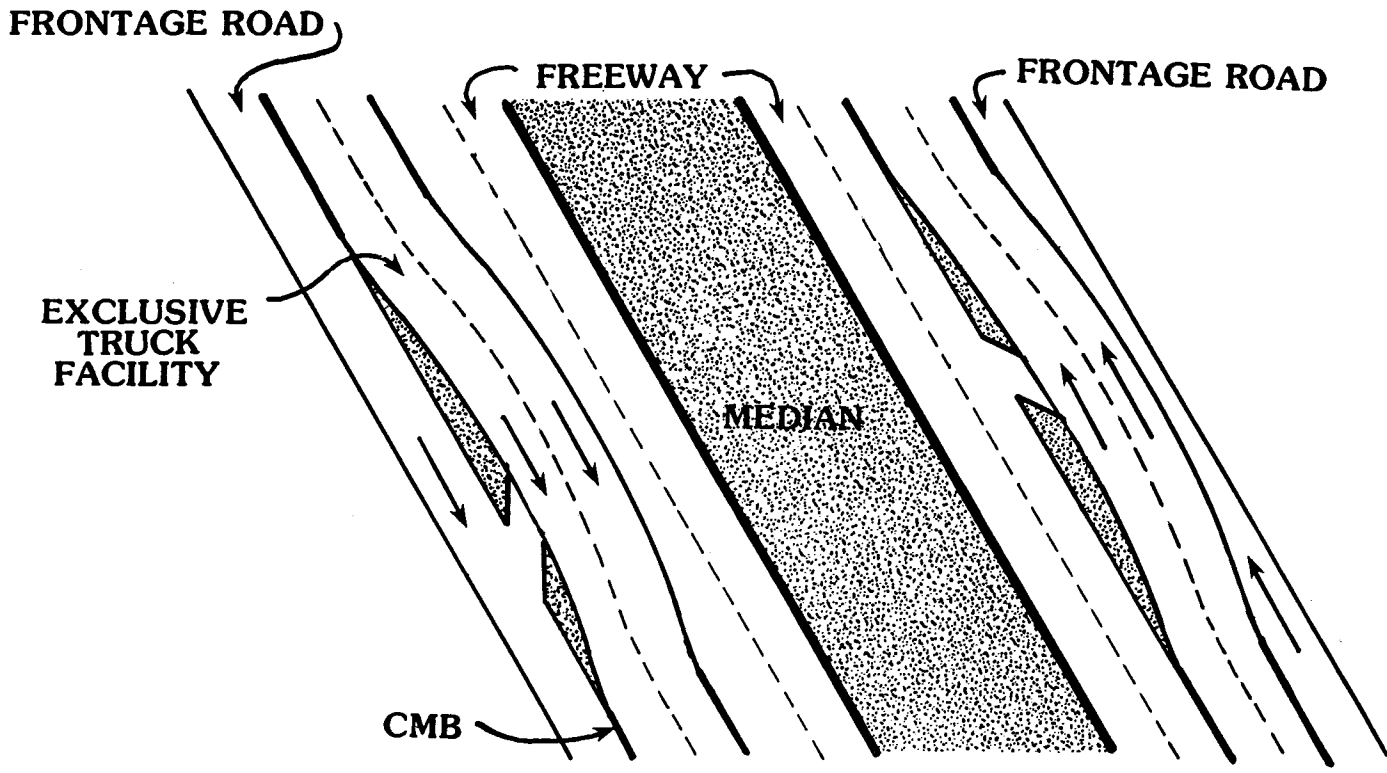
Proposed One-way, One-lane Frontage Road with Exclusive Truck Facility
